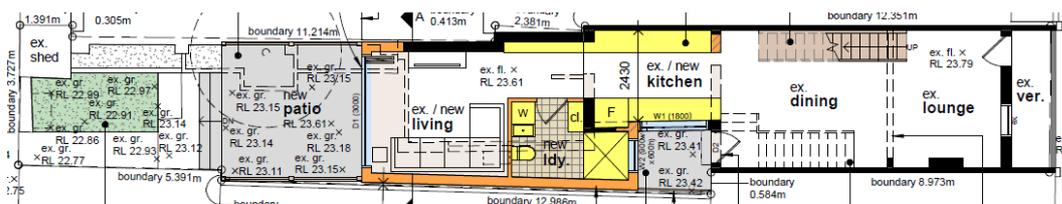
Proposed ground floor plan – 3 Oswald Street Randwick (Source: John Spiteri Design and Drafting)
